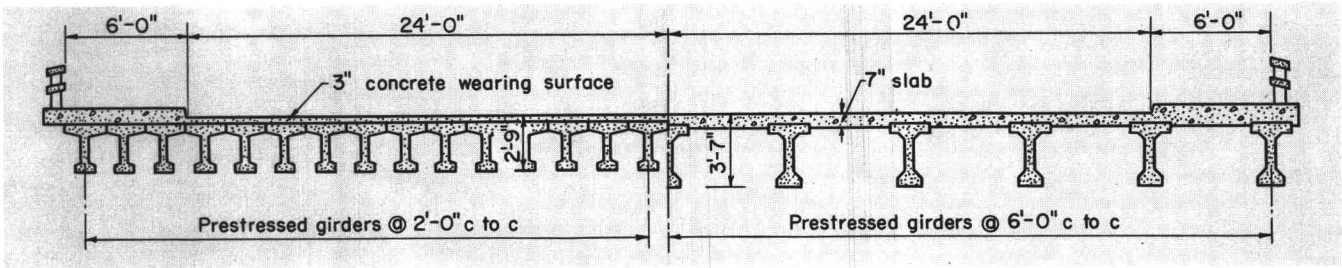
Alternate layouts of prestressed concrete girders in a bridge superstructure.
